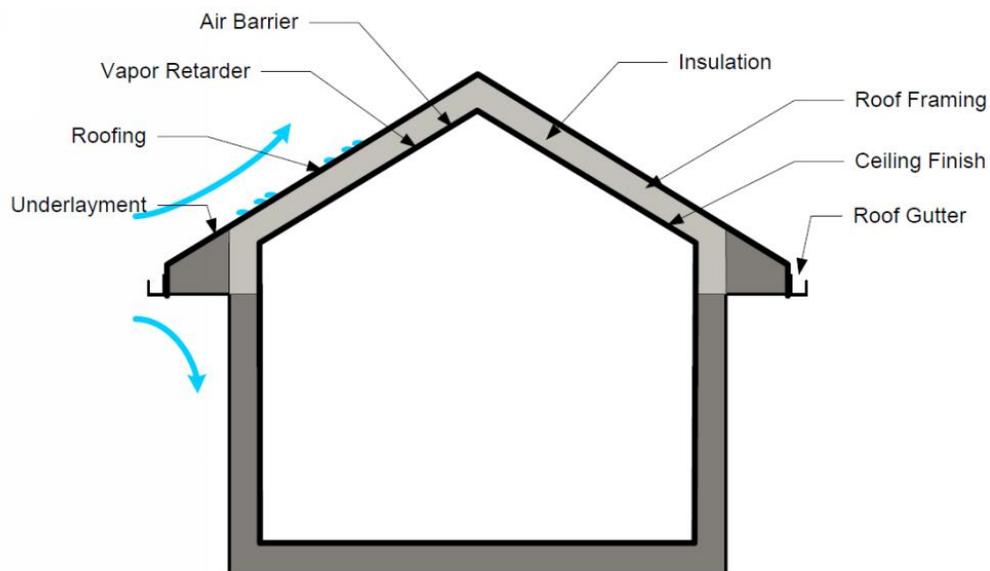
Unvented Cathedral Ceiling (image credit Schumacher¹)
